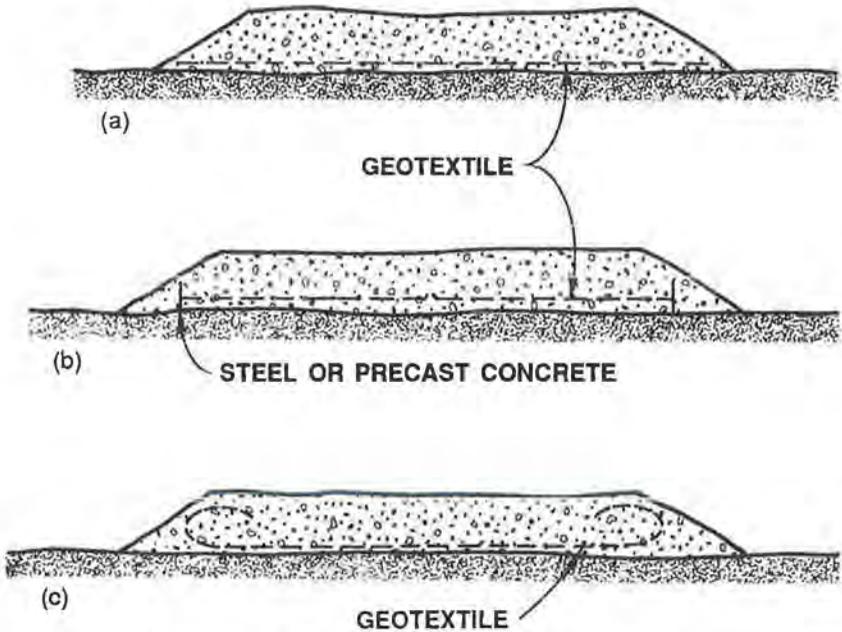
Concepts for using geotextiles to reinforce embankments on soft foundations (Christopher and Holtz 1985).
